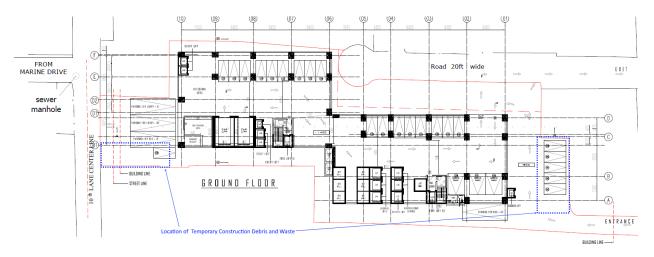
Locations of Temporary Construction Debris/Waste Collection
